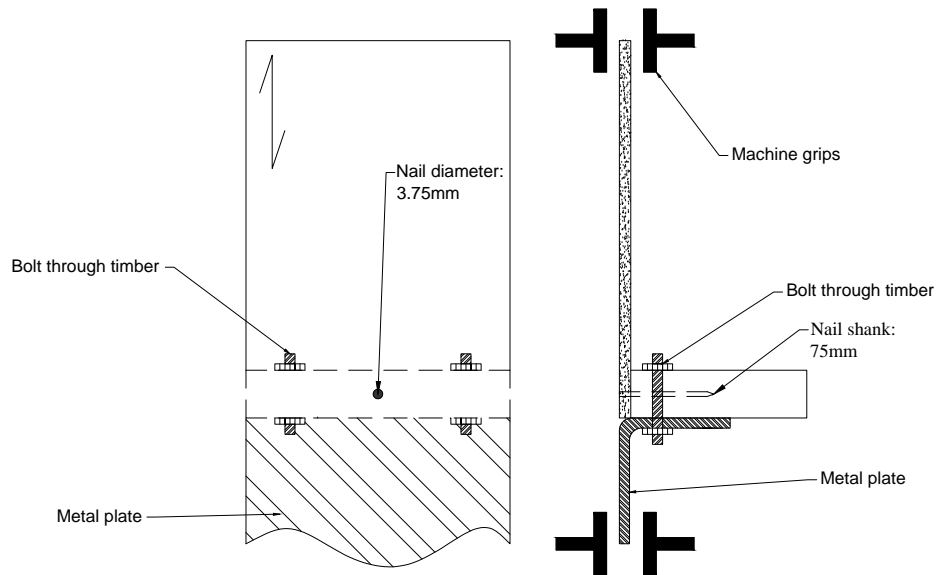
Loading set-up for the perpendicular specimens. The OSB sheathing is clamped by the upper jaws. A metal plate is bolted through the timber and held by the lower jaws. Bolts are tightened until the washer begins to bear on the timber. This set-up ensures displacement only occurs in the nailed connection.
